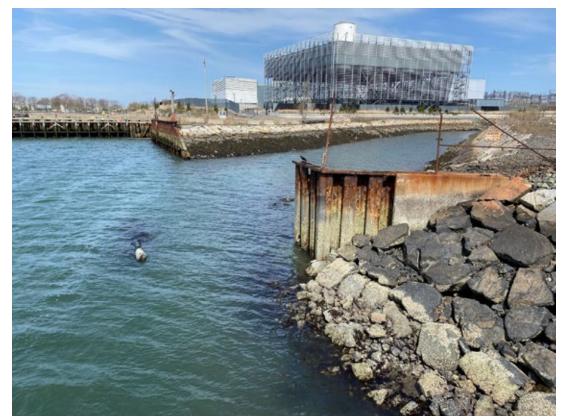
View looking west towards the existing wharf and bulkhead from the east jetty
